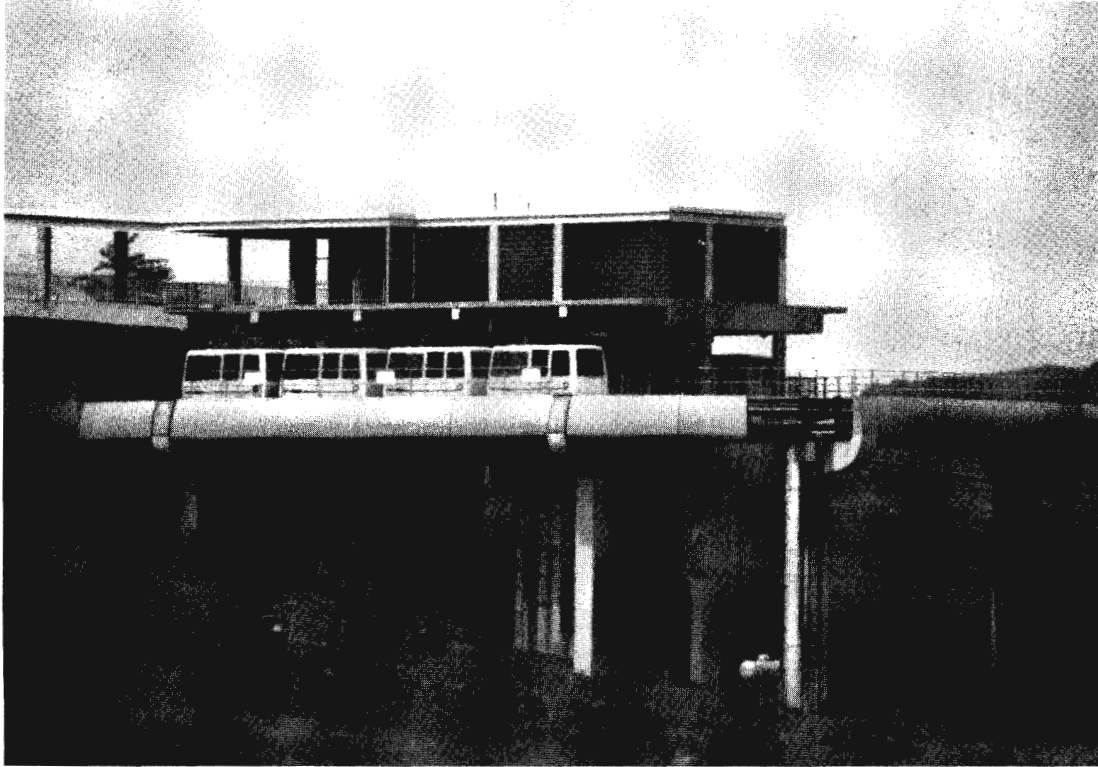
MORGANTOWN STATION AND GUIDEWAY.
